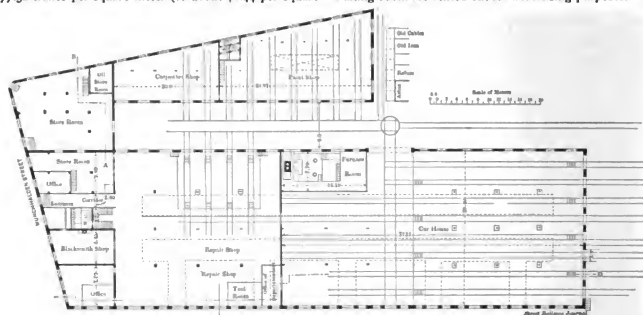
PLAN OF CONCRETE CAR HOUSE IN SEEFELDSTRASSE
